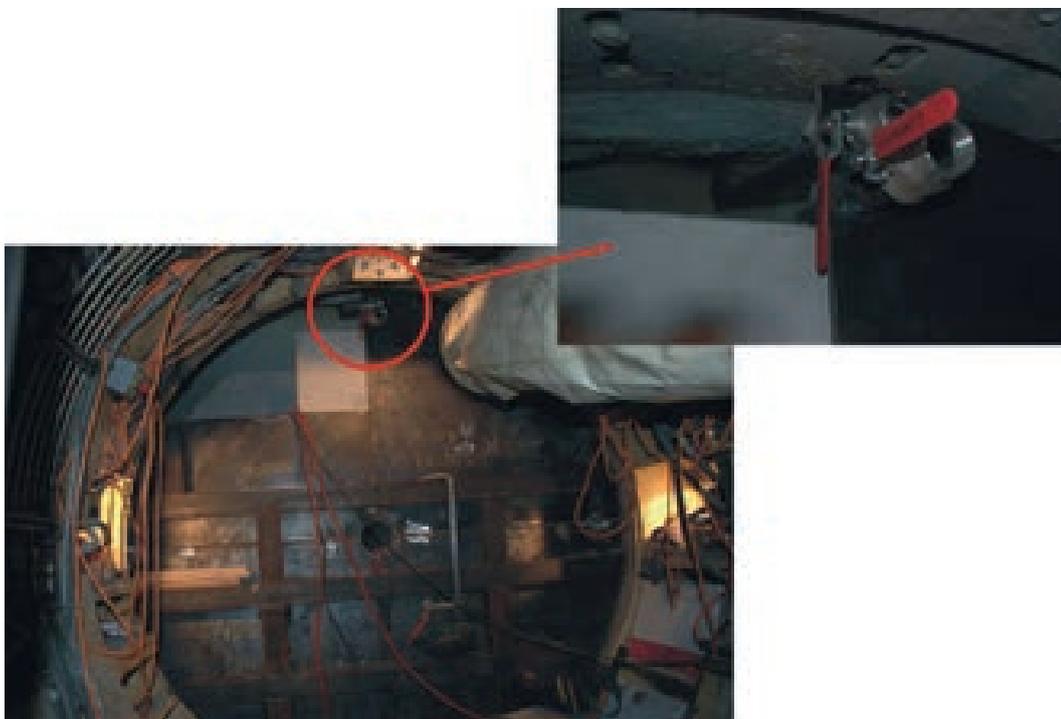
Reinforcement structure with tap on top to inject the last concrete.
